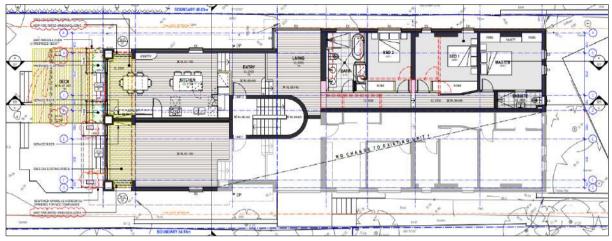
Extract of Ground Floor Unit 1 and Unit 2 showing area of proposed works
